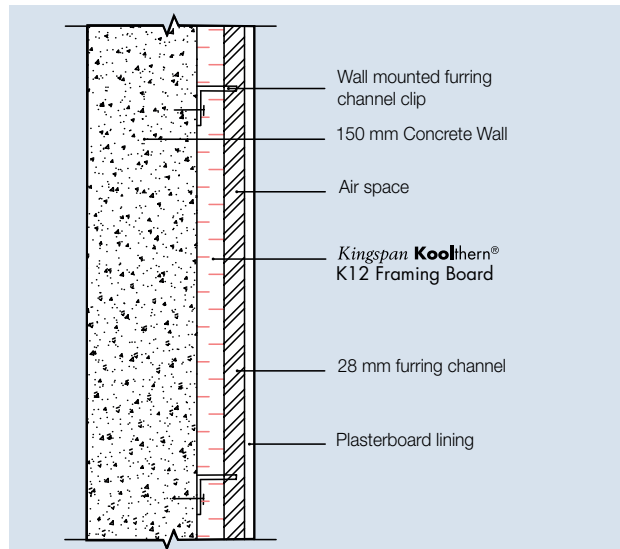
Side elevation of *Kingspan Kooltherm*[®] K12 Framing Board clip-and-channel system
